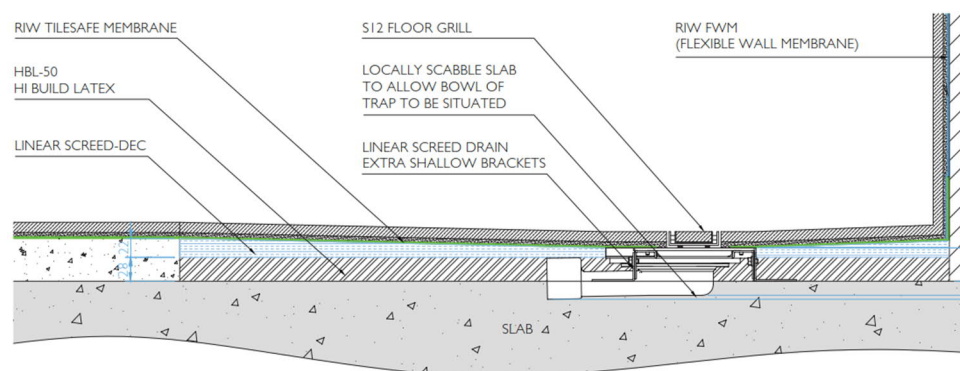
Example of a wet room floor structure (Wetrooms UK Ltd, n.d.)
